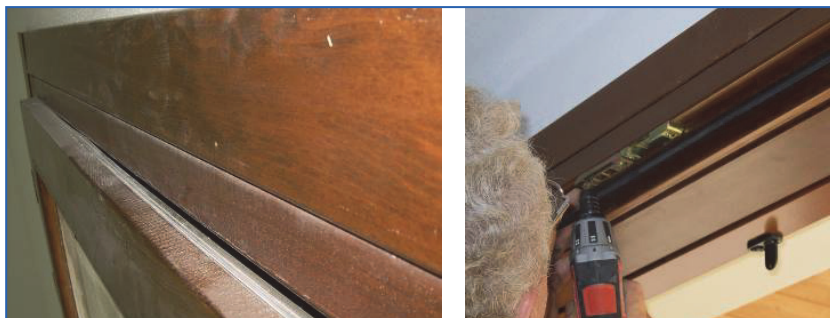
Details of the main windows defect (left picture) and detail of window fine setting (right picture).
